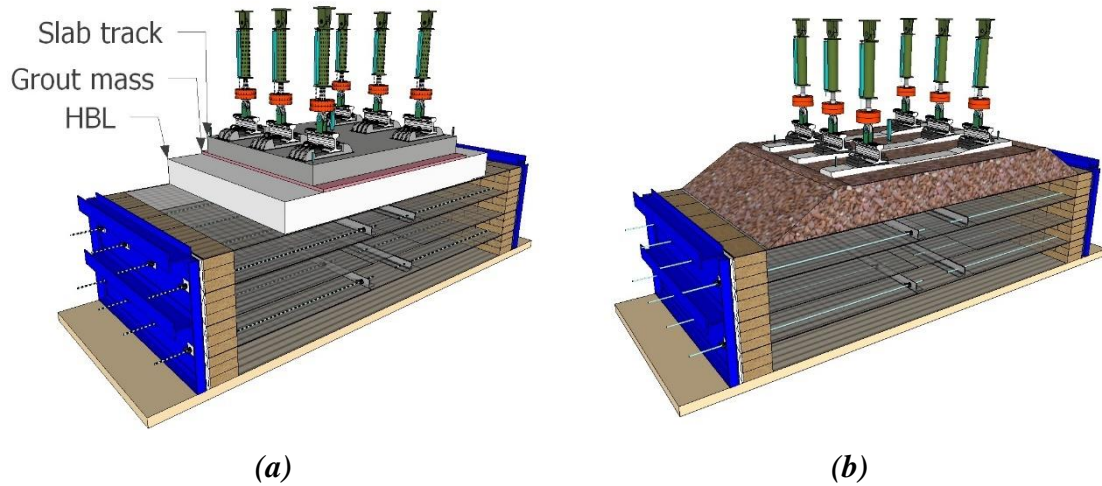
Layout of the ballast and slab tracks on GRS-RW embankment (a) concrete slab-track; (b) ballasted track
